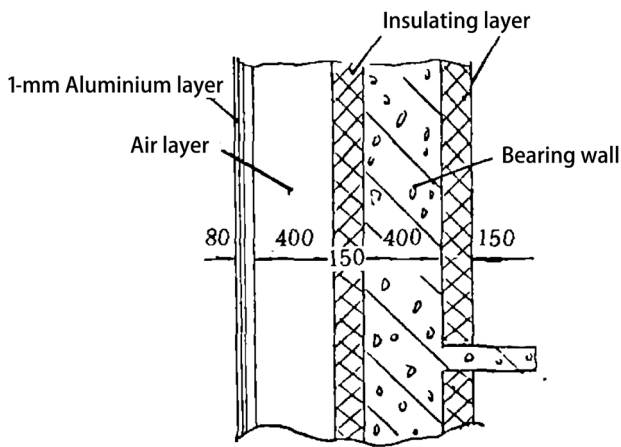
The sectional drawing of the three layers cylindrical wall.
